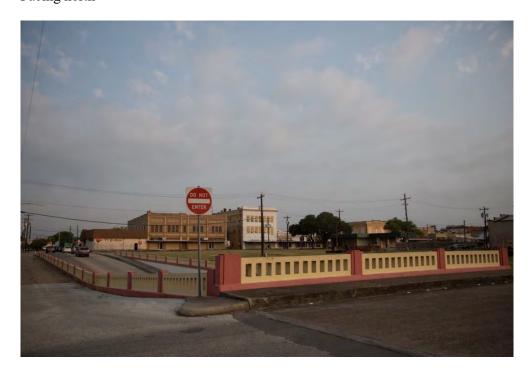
Corner of W. Grand Avenue and Lott Street Facing north
